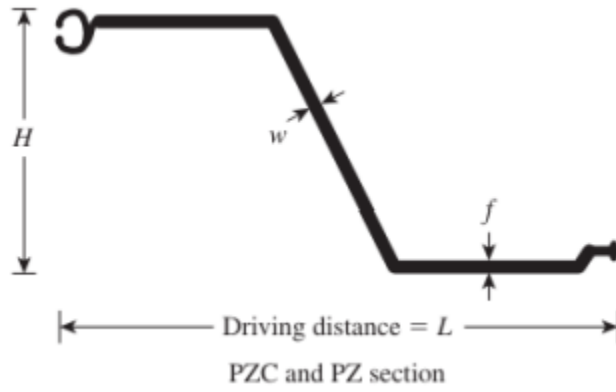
Cross-section of PZ section of steel sheet piles.
